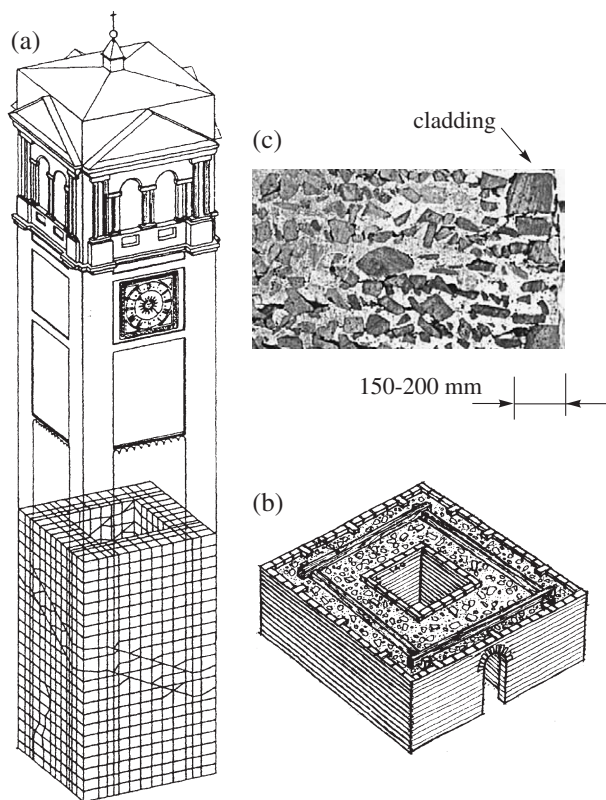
Ancient tower: (a) geometry and finite element mesh of the Civic Tower of Pavia, Italy (after [5]); (b) typical cross section; (c) photo of the masonry wall of the Civic Tower of Pavia.
